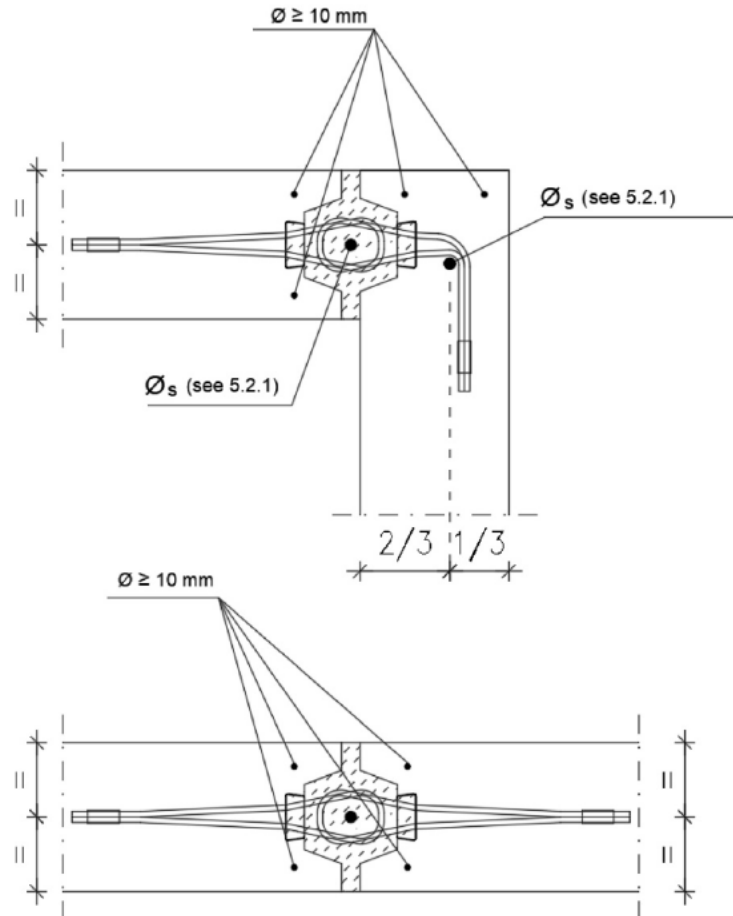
RVL wire rope loop additional reinforcement without anchor reinforcement
